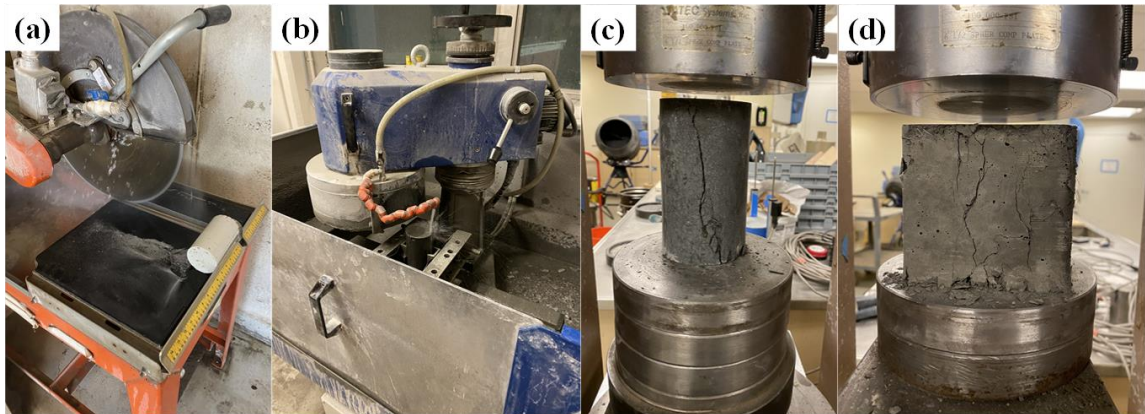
Testing procedure: (a) cutting the cylinder (b) grinding the cylinder (c) testing cylinder specimen (d) testing cube specimen
